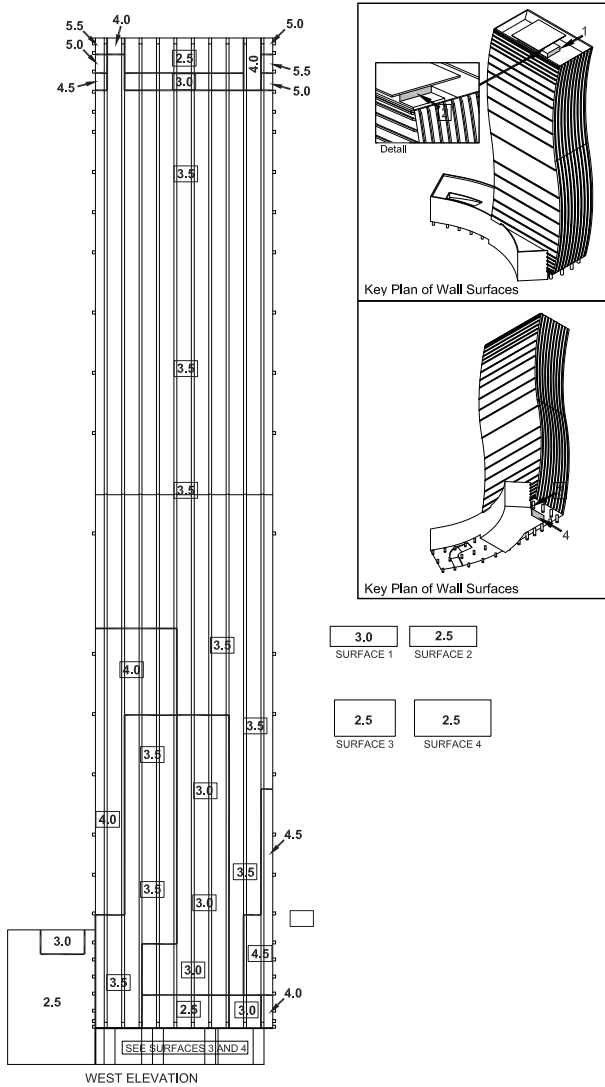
Wind tunnel test study, determining wind loads for cladding design. Peak net negative pressures. © RWDI
